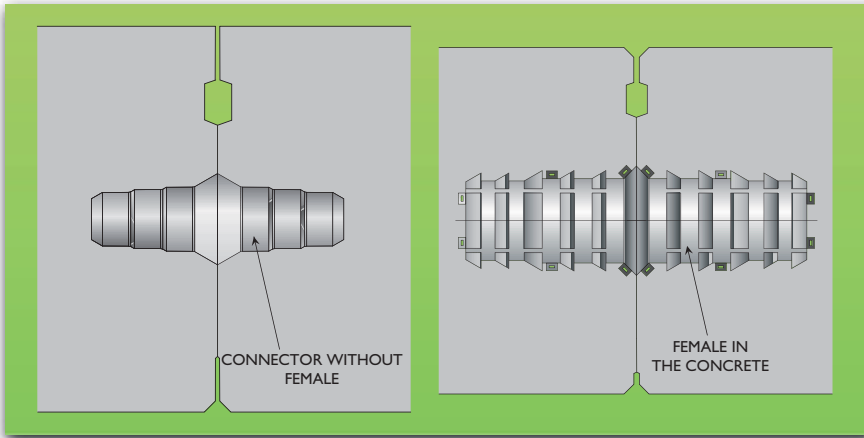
Section of a typical room for a single plastic connector (dowel).
